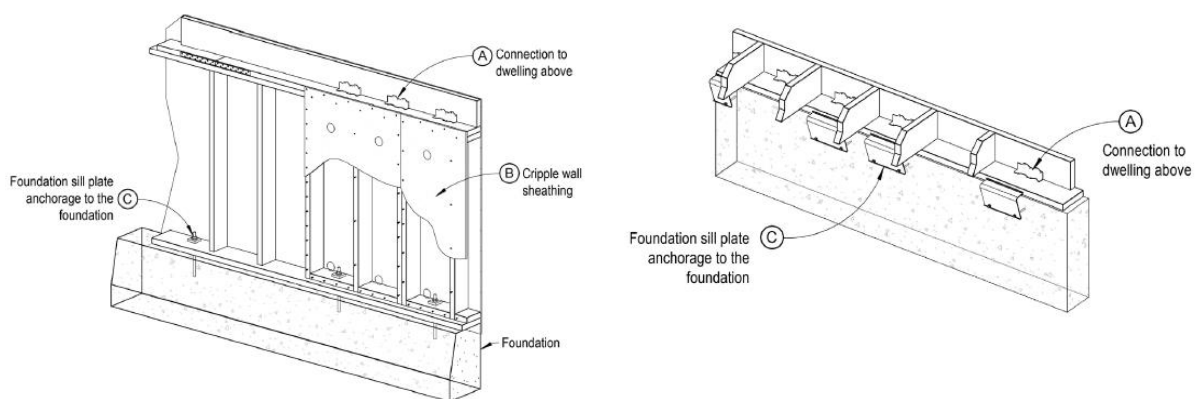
Seismic retrofit of the cripple wall foundation (left) and the stem wall foundation (right). [1]
